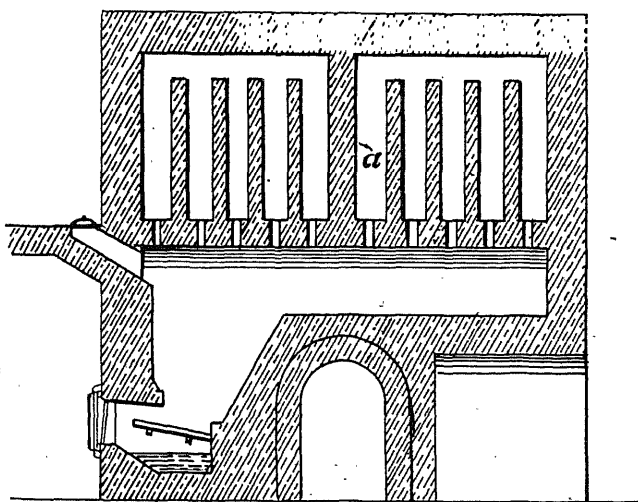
Longitudinal Section through Horizontal Bench Heating Flues.
